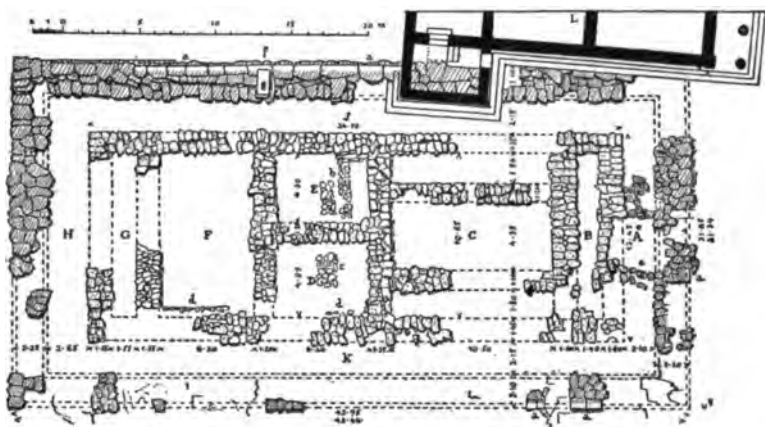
Foundations of the Old Temple of Athena indicating interior plan.
